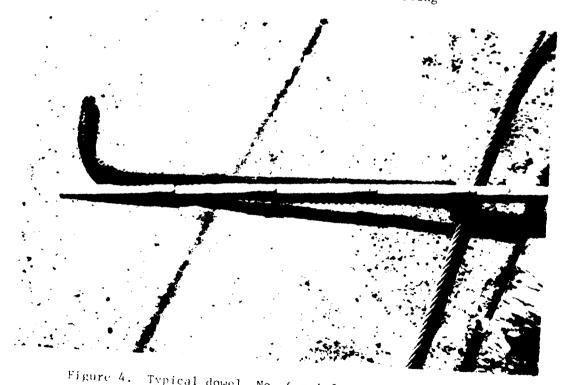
Typical dowel, No. 6 reinforcing bar (ASTM 1978)
